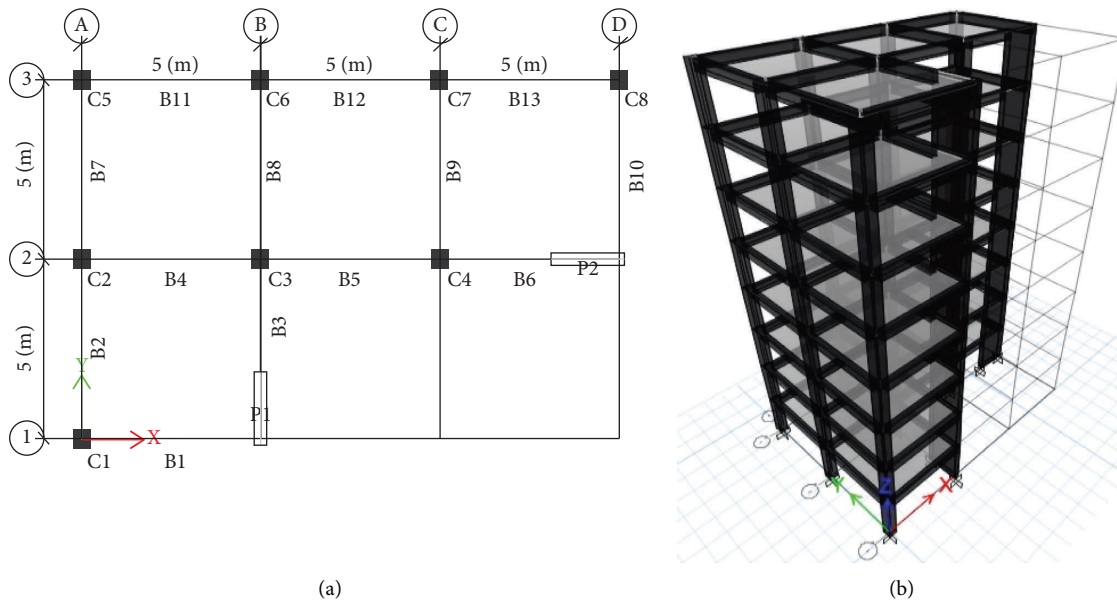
Example 2, (a) Typical floor plan view. (b) 3D view.
